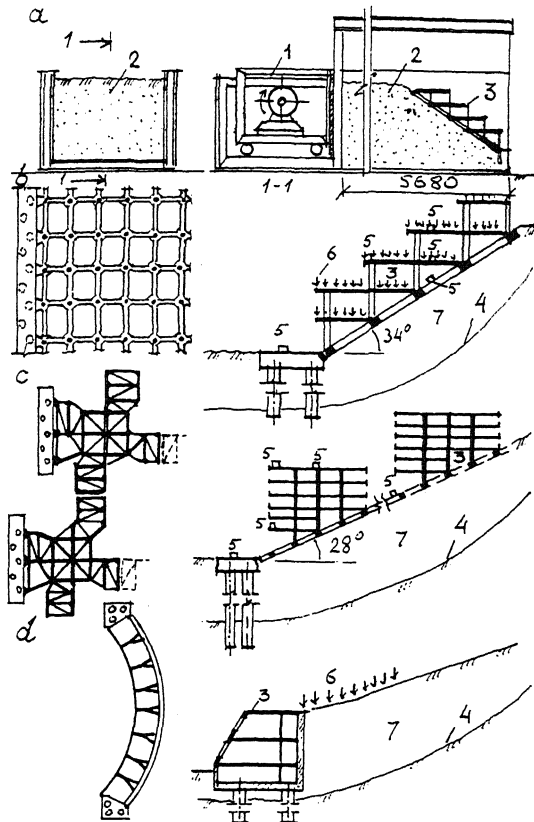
Test plant: ground chute (a), models of: terraced building (b), isolated buildings (c), buildings-breast-walls (d):
